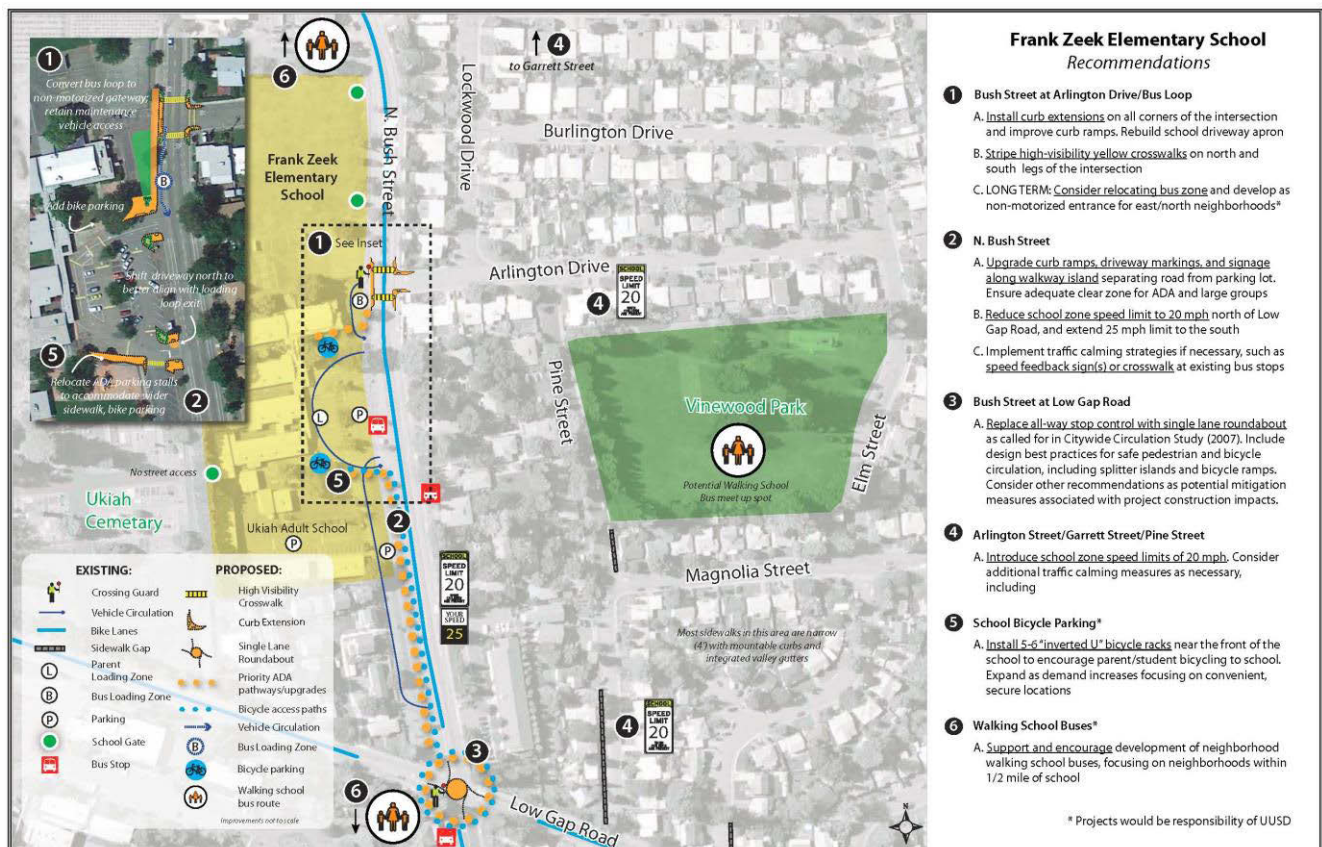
Example of Detailed School Route Improvement Plan (Source: City of Ukiah Safe Routes to School Plan)
